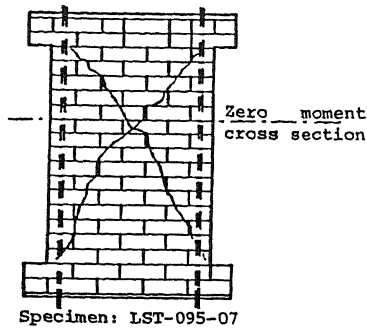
TYPICAL SHEAR CRACKS OF A SLENDER PIER THAT FAILS IN A SHEAR MODE
